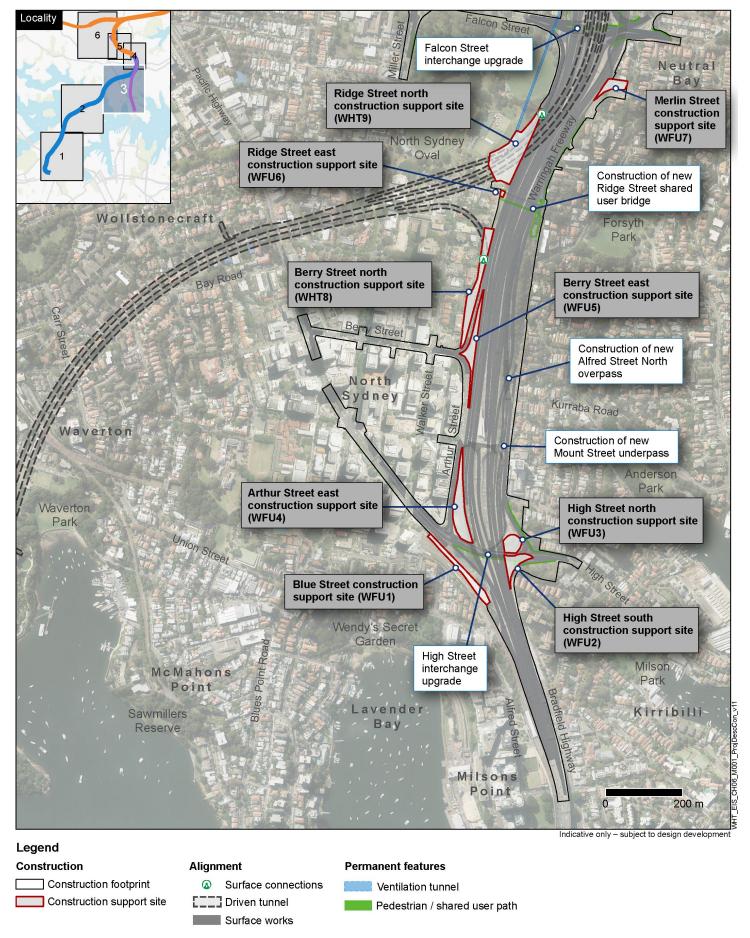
Overview of construction activities and construction footprint (map 3)
